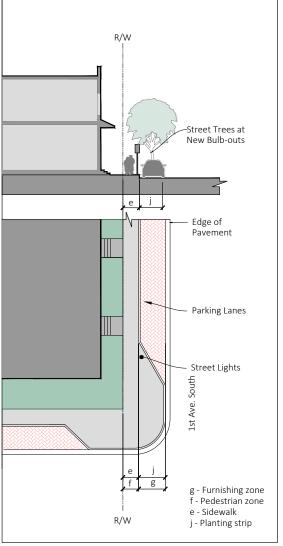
1ST AVE. SOUTH STREETSCAPE
